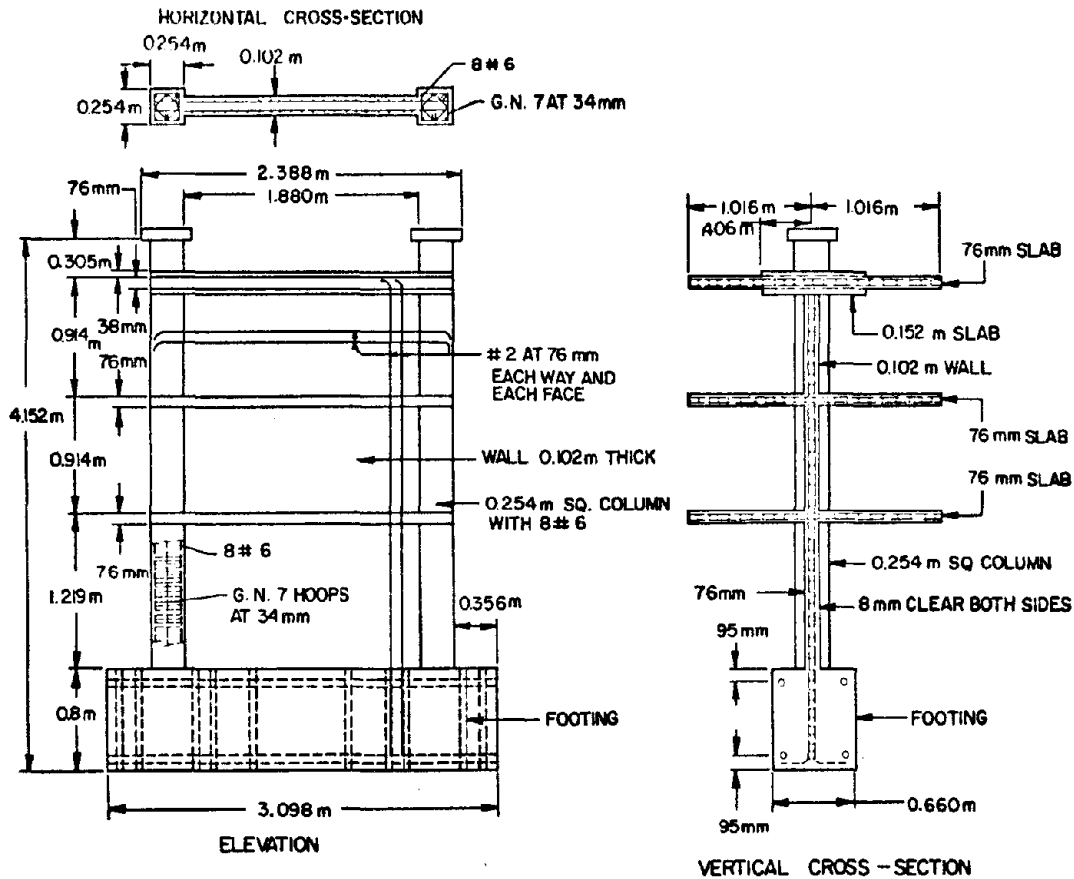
Dimensions and Details of Framed-Wall Specimens
